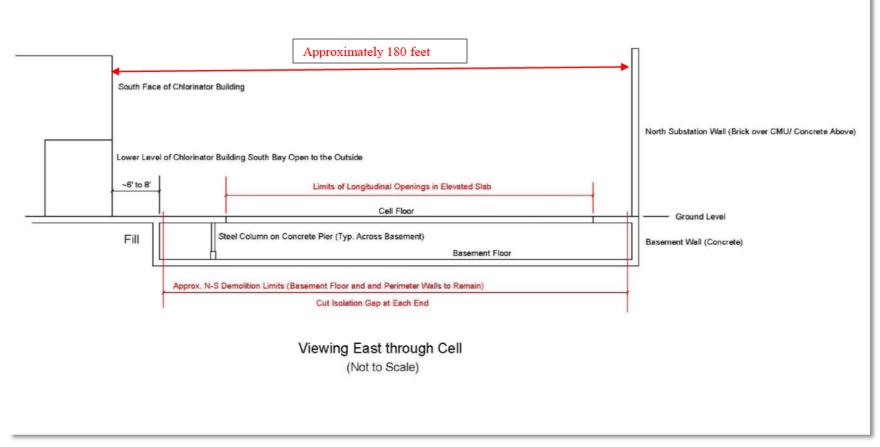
Schematic cross-section looking east through Unit 4 Cell Building
